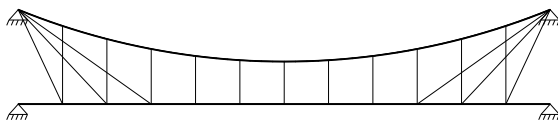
Suspension bridge stabilization by application of inclined additional cables
